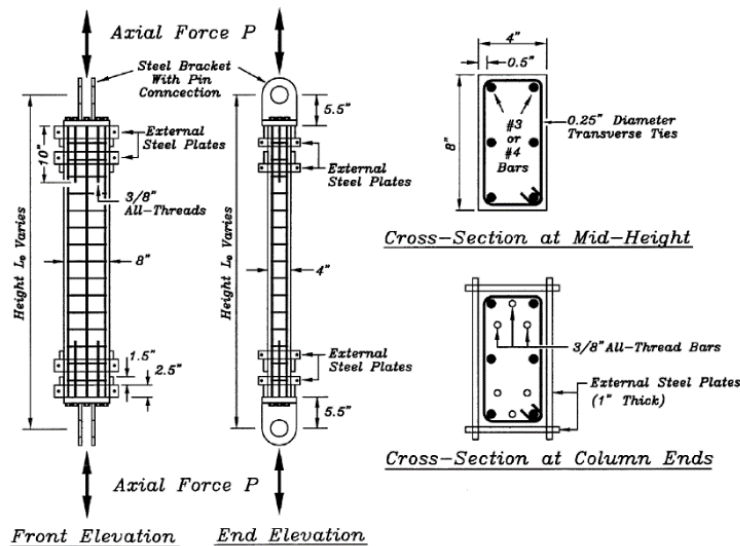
Reinforcement details for test specimens (1 in. = 25.4 mm).
